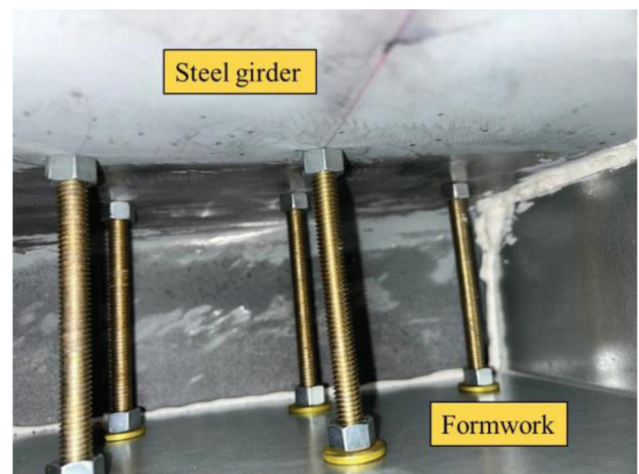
Connection of threaded rods to steel girder web and to stay-in-place formwork.
